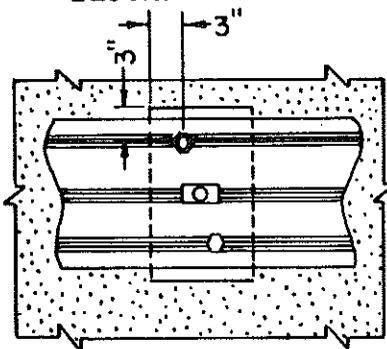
<b>STANDARD DETAIL</b>	<b>STEEL GUARD RAIL</b>	DETAIL NO. 135-3
